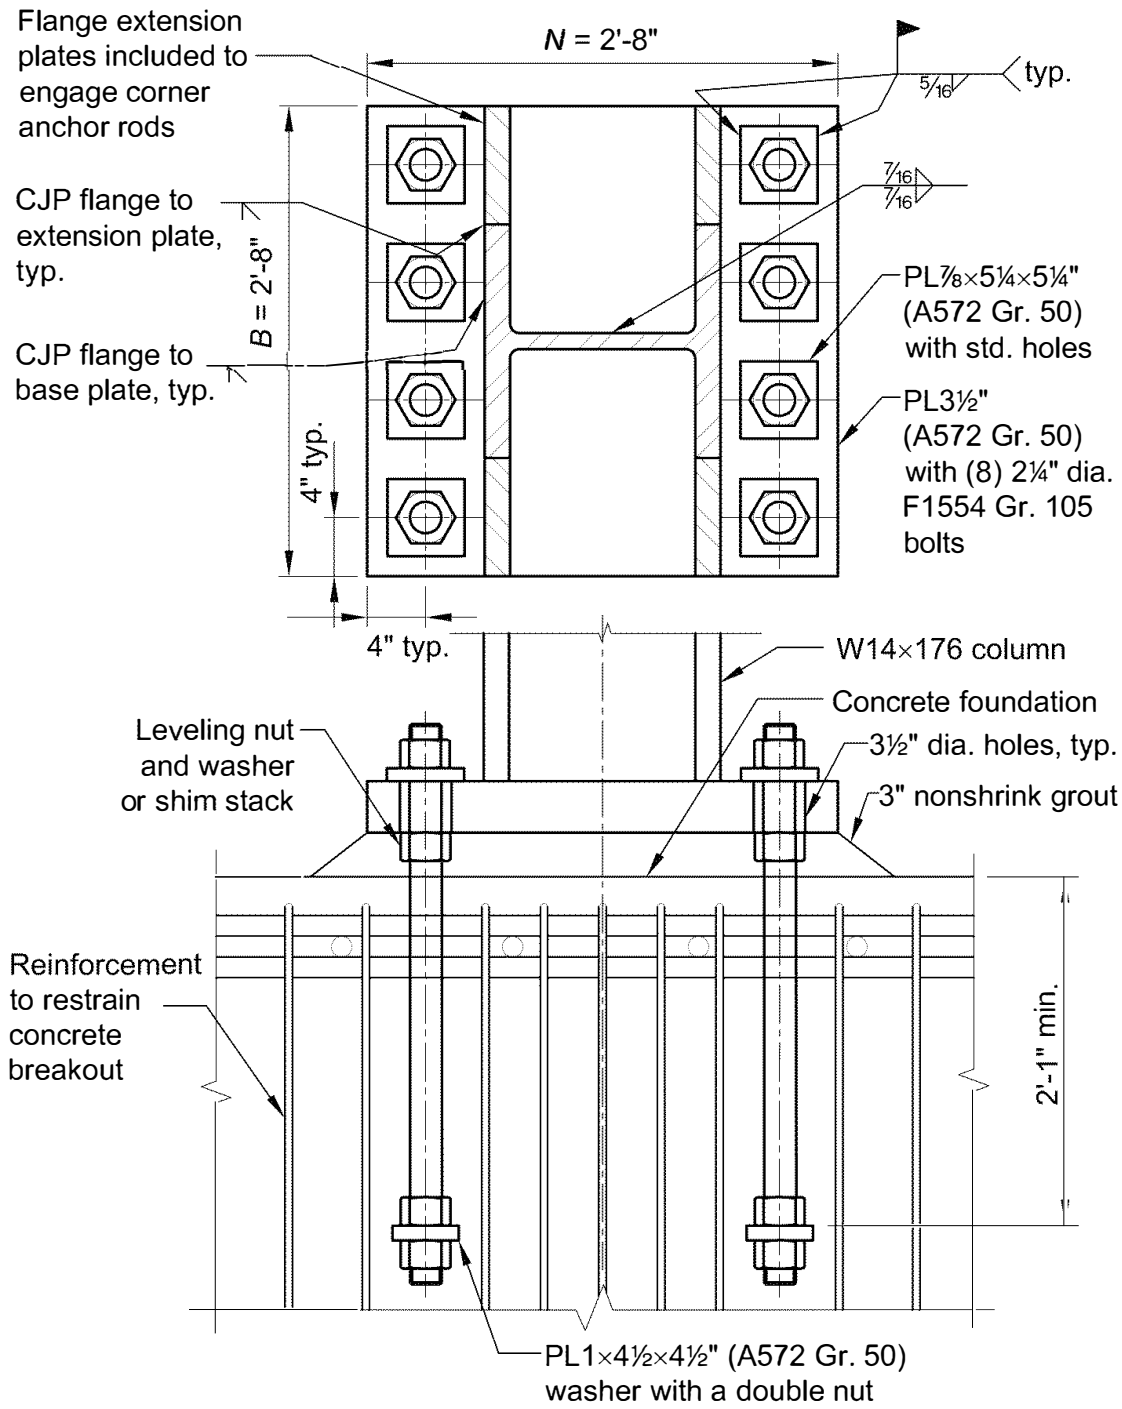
Connection cross section as designed in Example 4.5.3.
